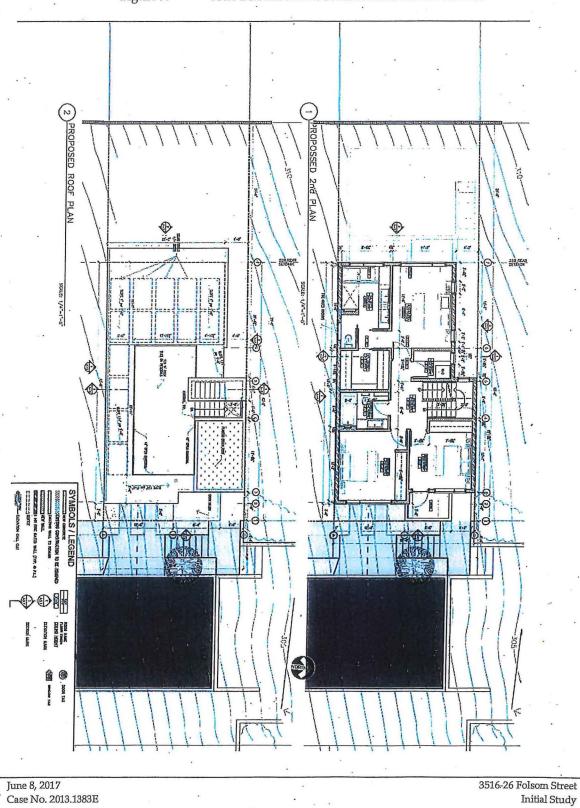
3516 Folsom Street: Second Floor and Roof Plans
